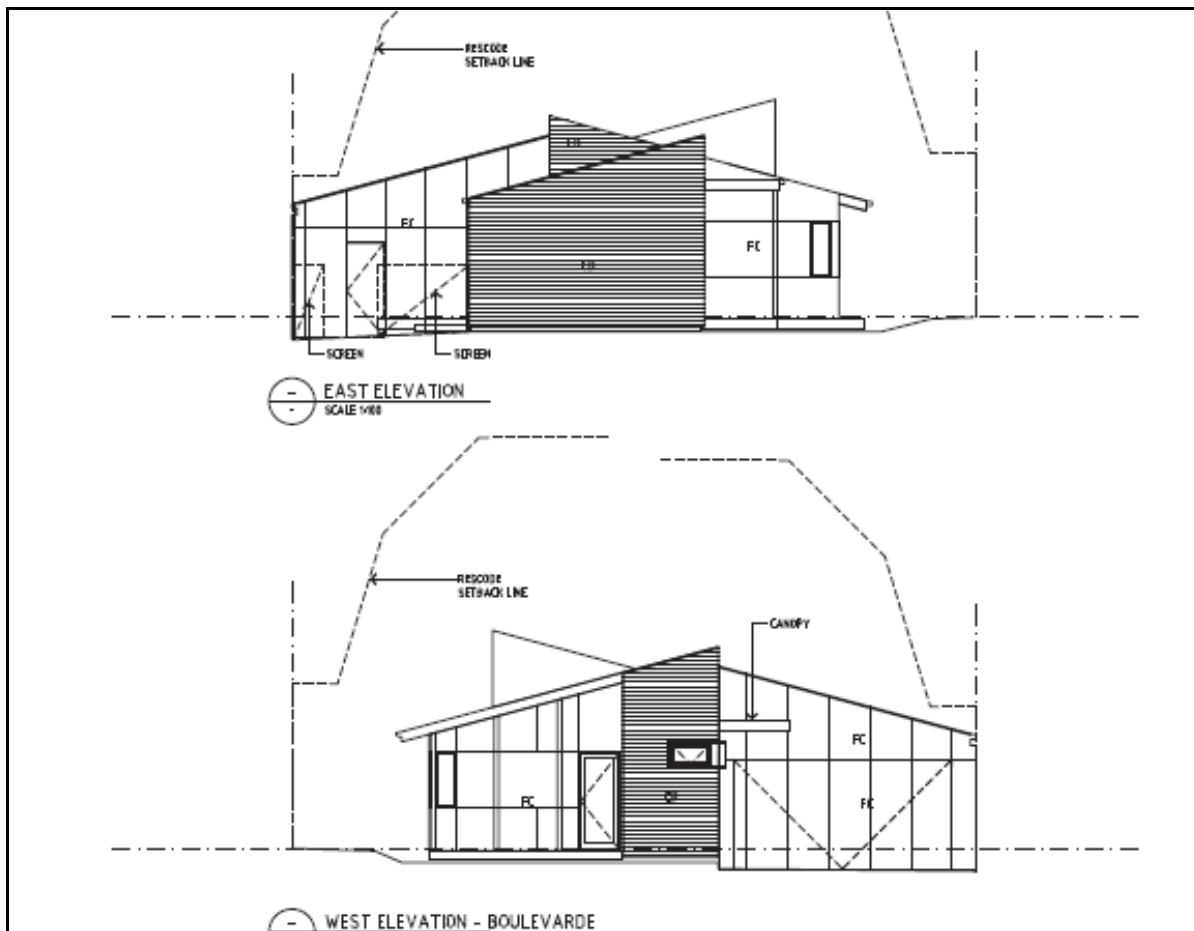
Proposed elevations (Adam Dettrick Architect, 2012).
